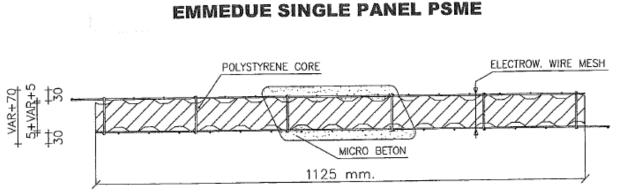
Emmedue Single Panel PSM80 Details (Ref. 1, p.7)
